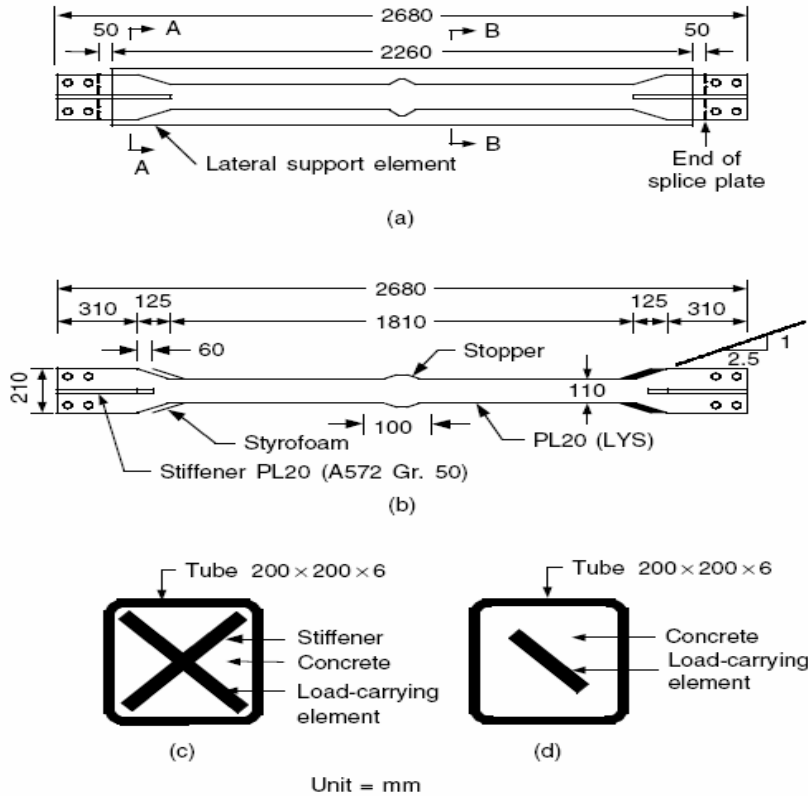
Details of Buckling inhibiting brace; a) overall view; b) load carrying element; c) A-A section; d) B-B section (Chen et al.)
